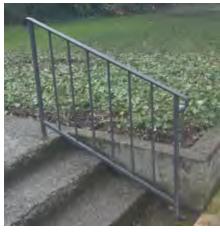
1456 Court Street NE - single railing at sidewalk stairs
